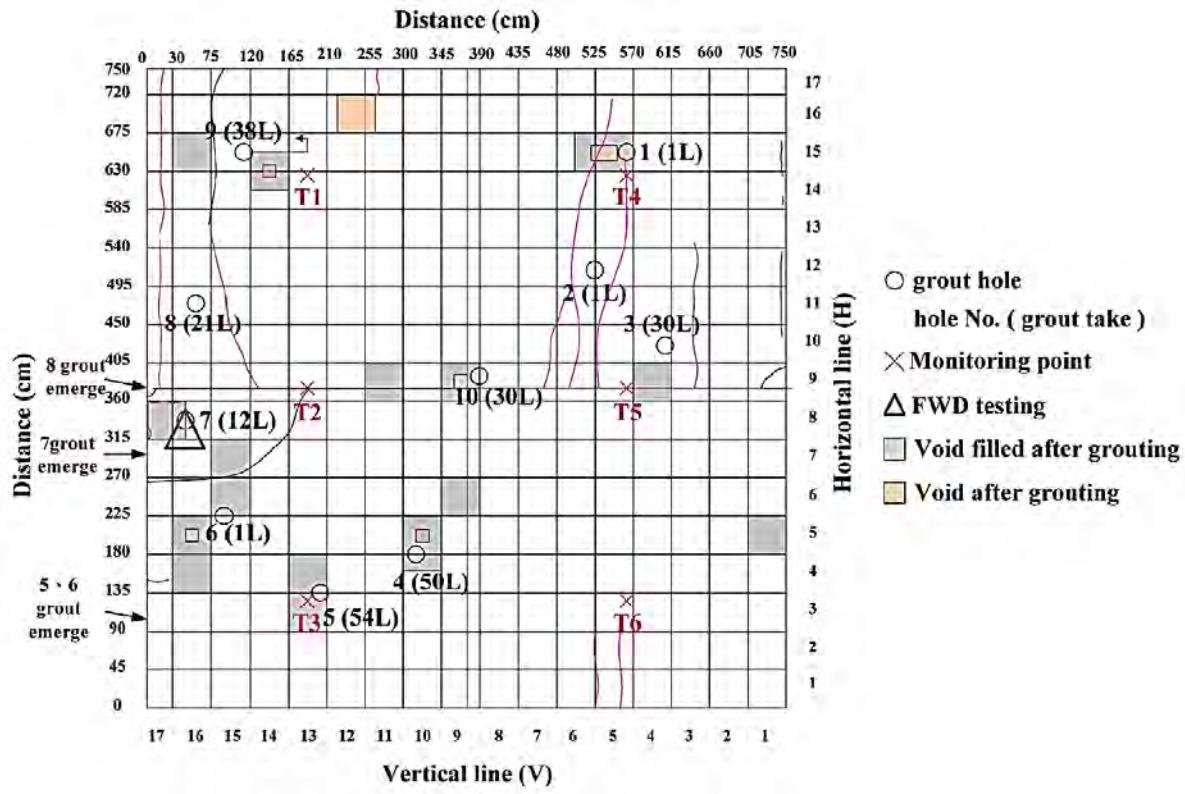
Results from concrete slab 3 monitoring, Magong airport.
